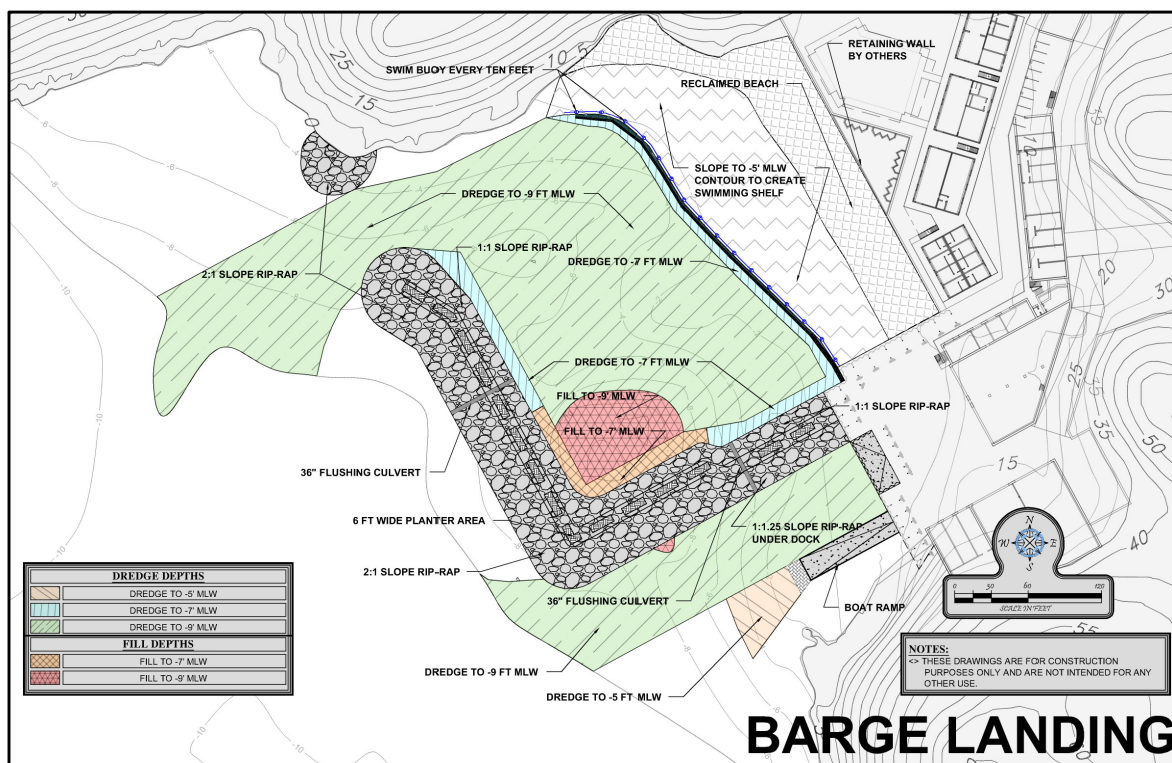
Barge Landing Dredge, Seawall, and Breakwater Plan (Exhibit 6)
